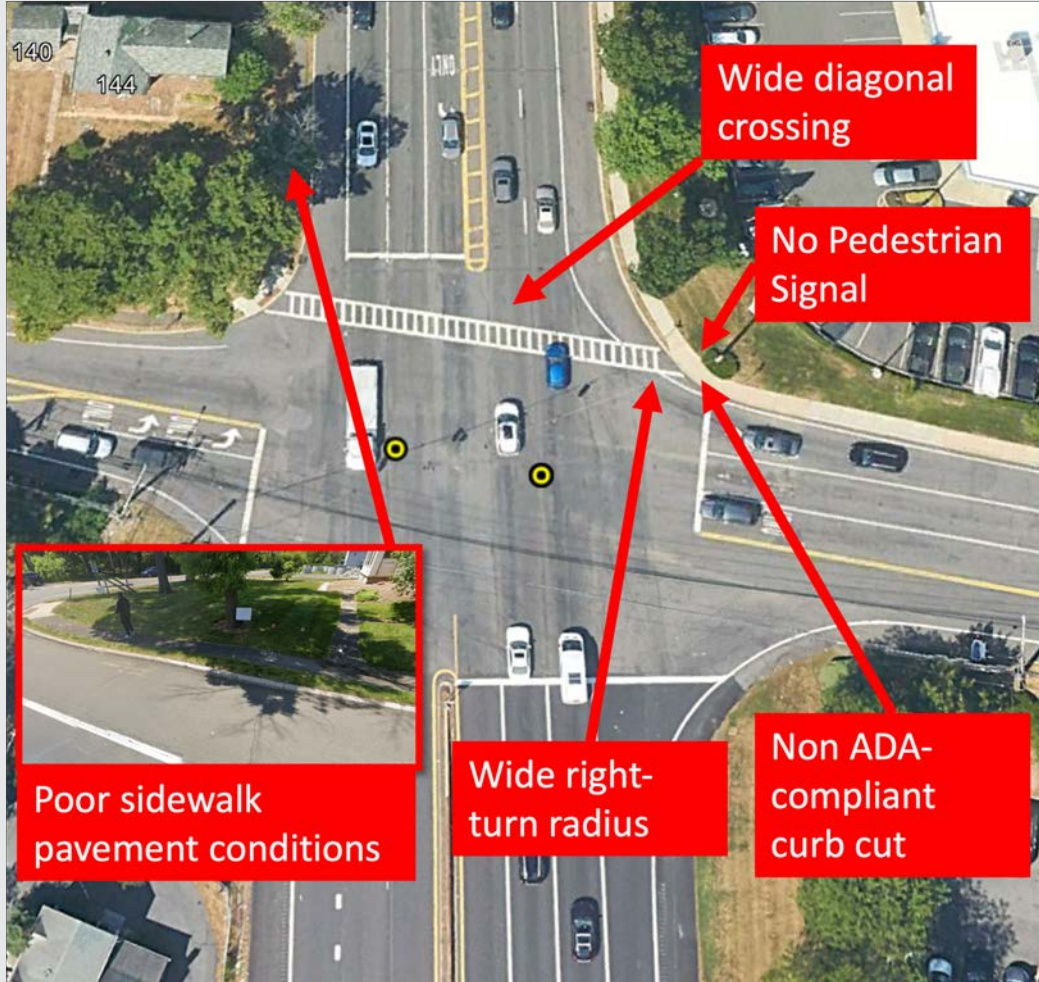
Roadway Design Challenges at the Route 304 and West Nyack Road Intersection
